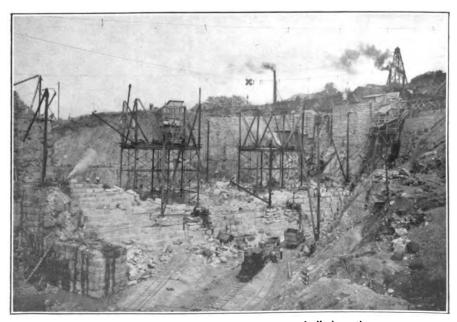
Fig. D.—New Croton dam. These steel towers were built into the masonry.
